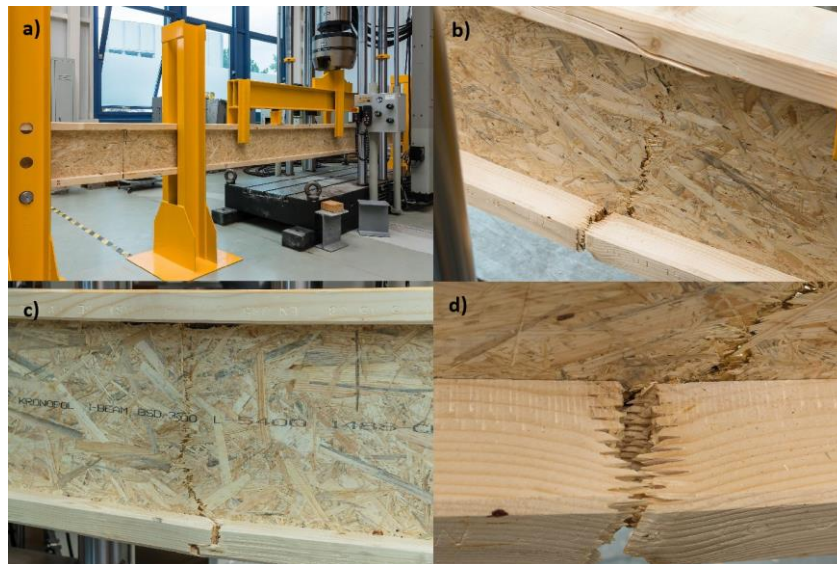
I-beam on the test stand a), left and right side of the beam after failure b), c), and the damaged finger joint in the bottom flange d)
